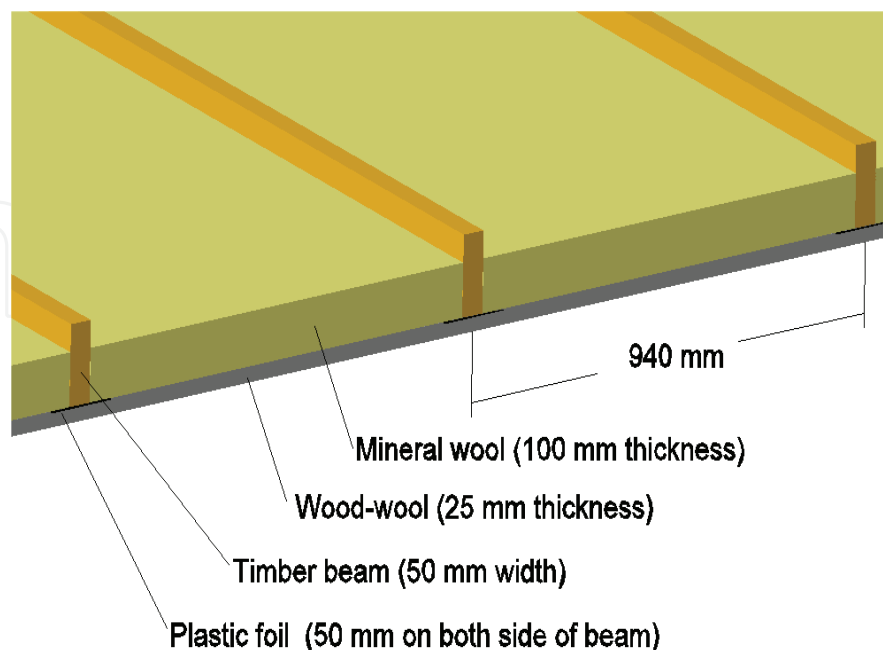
Typical construction for diffuse air inlet through ceiling.
